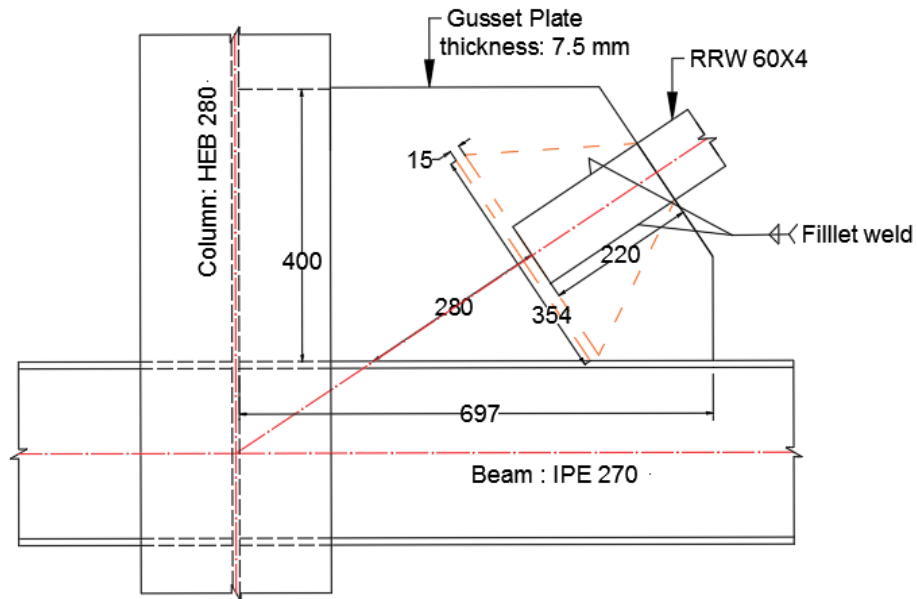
Connection detail for 1st and 2nd storeys (dimensions in mm)
